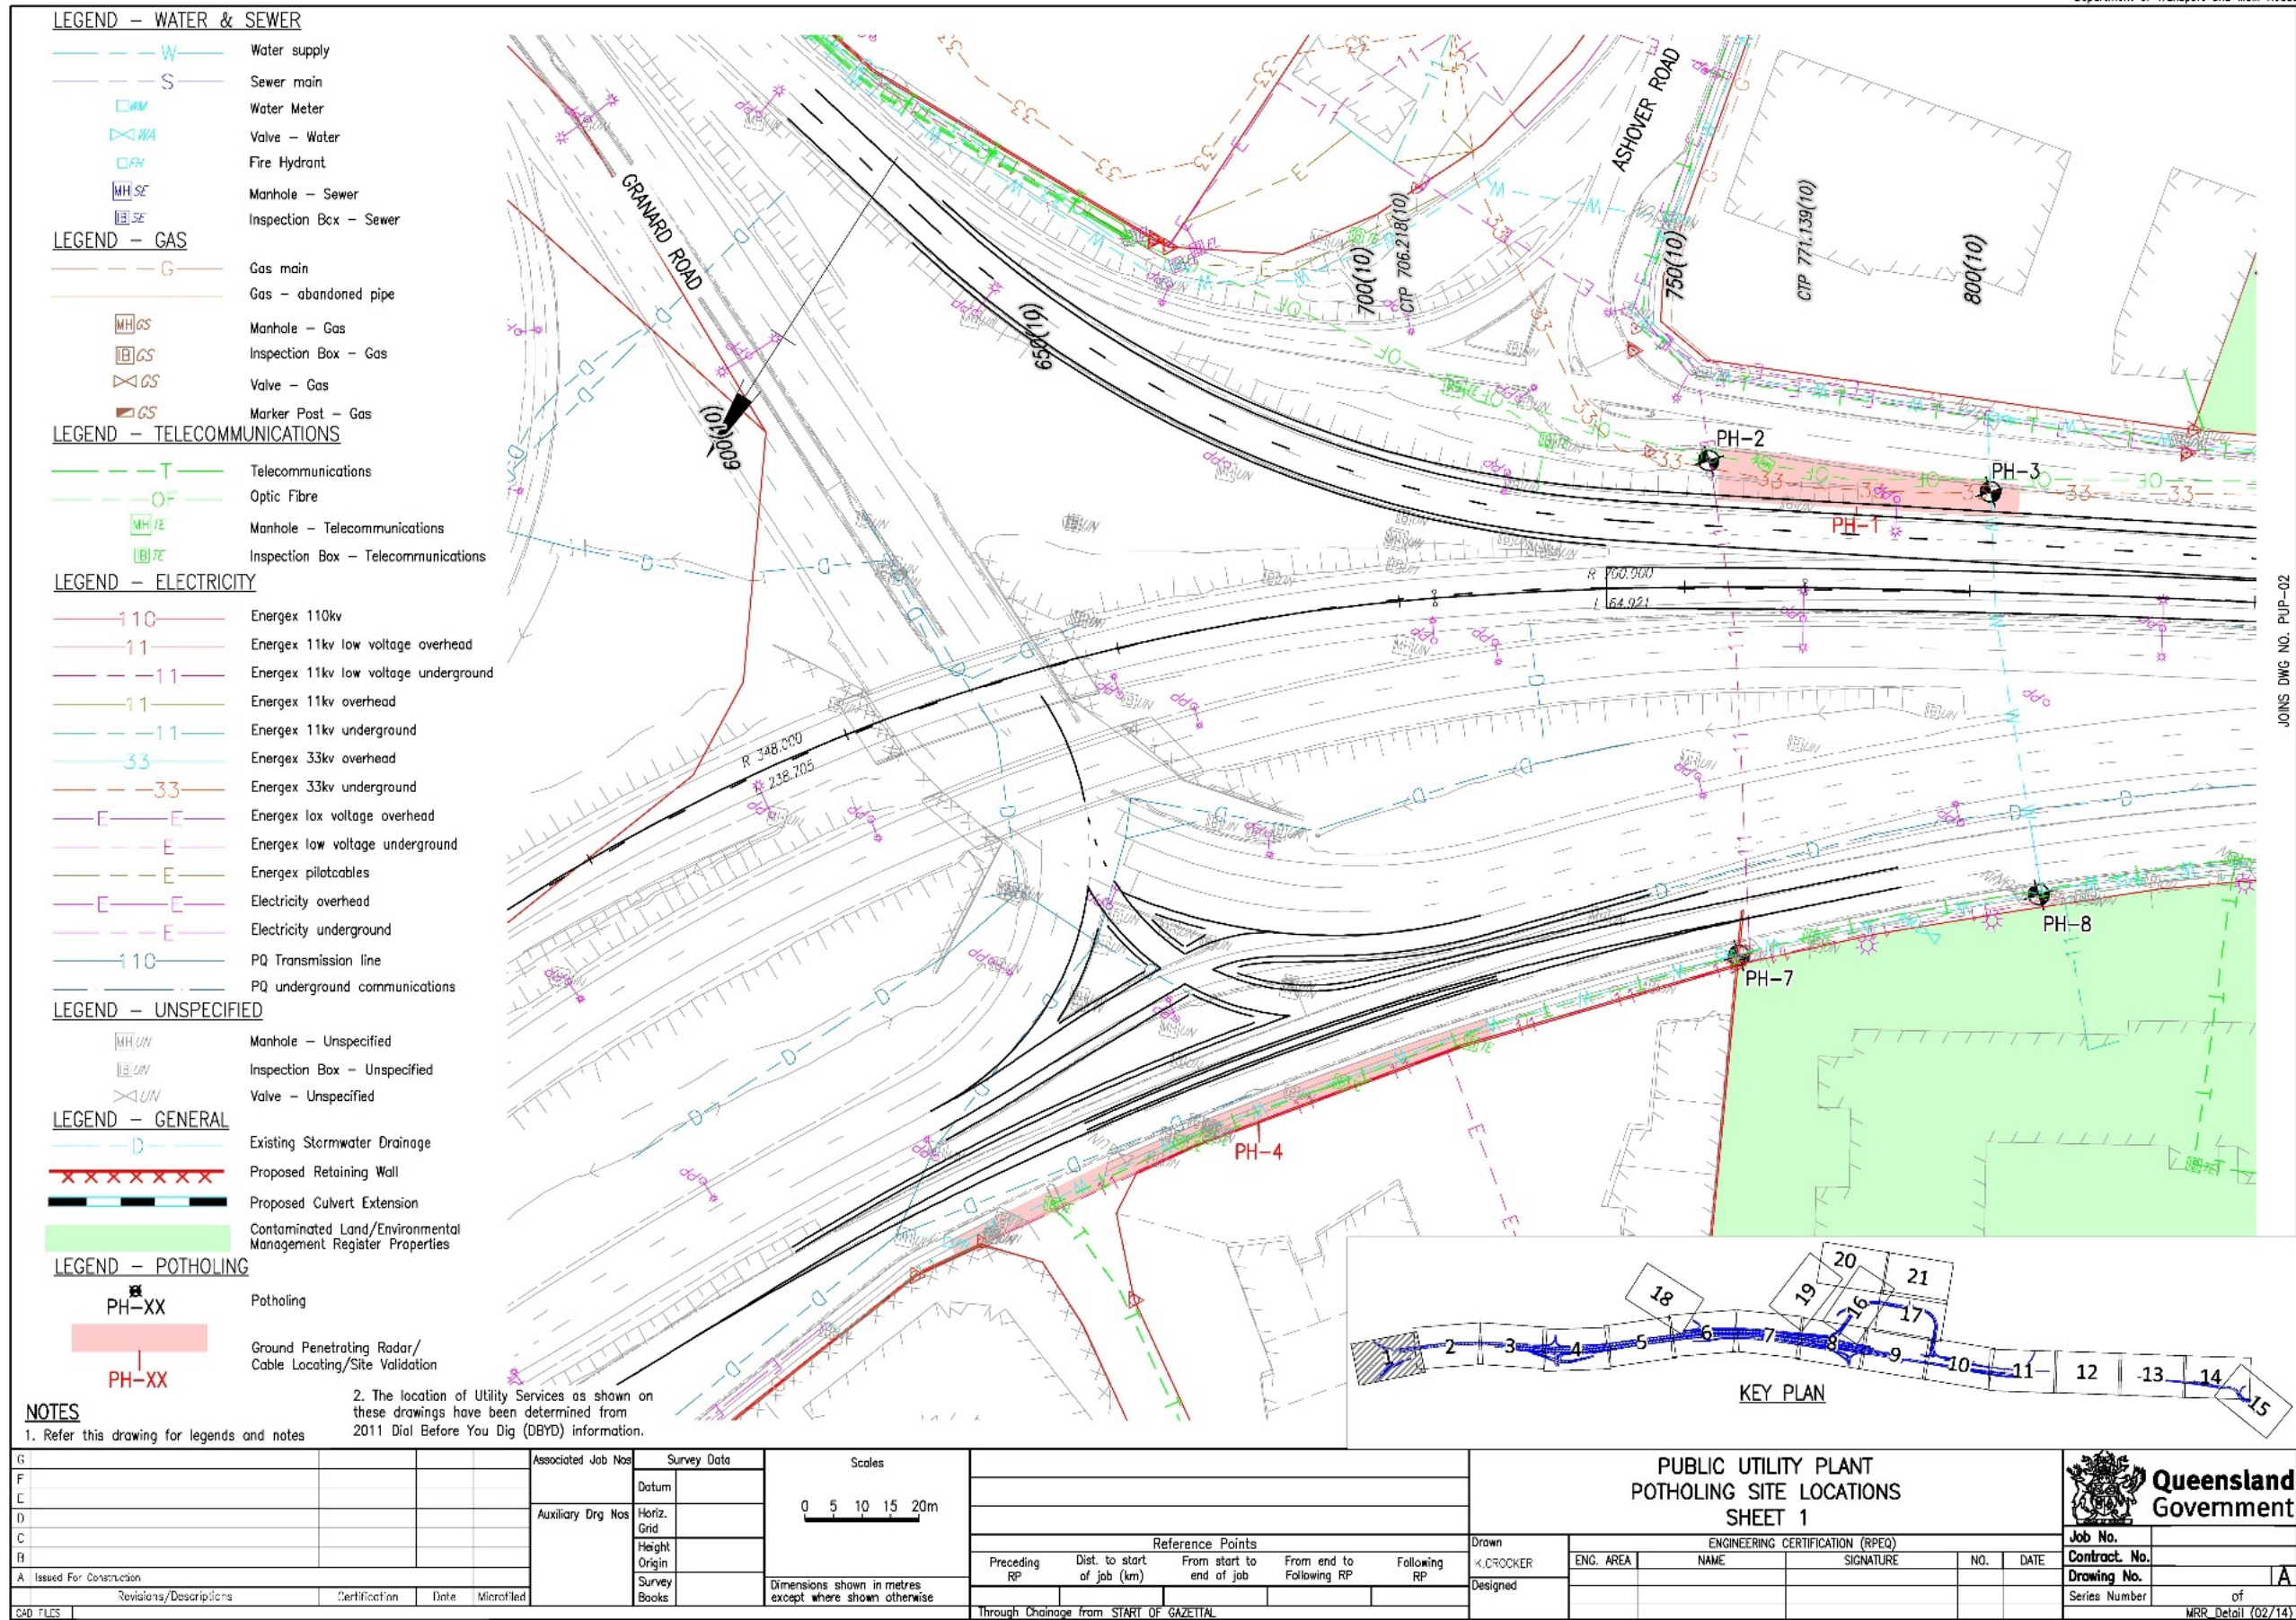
(b) – Public utility plant – Conflict Plans generic example – Sheet 2 of 2
